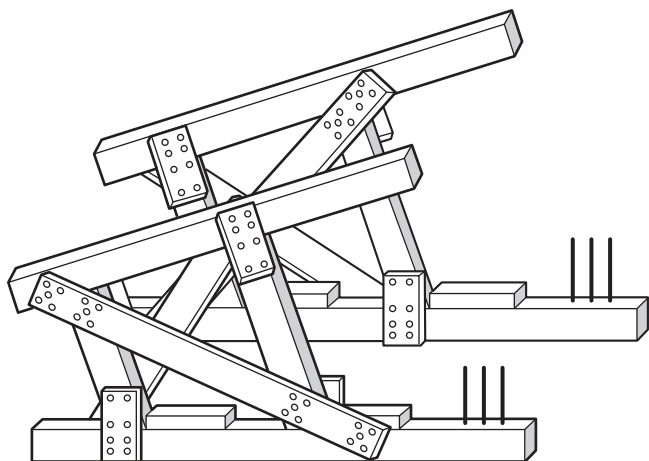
(c) Sloped Floor Shore Type 2.
